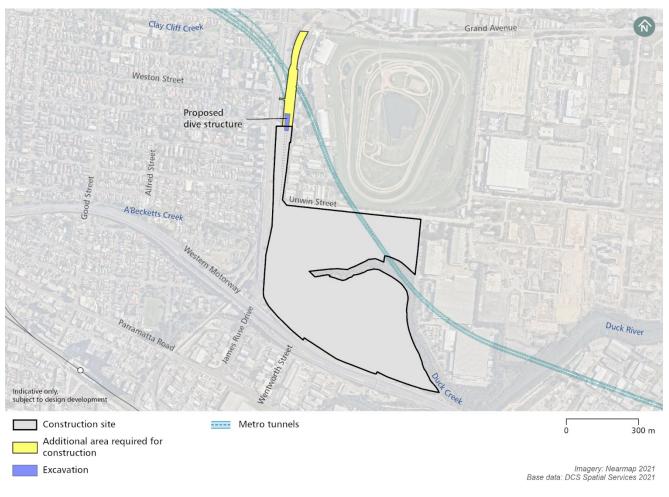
Clyde stabling and maintenance facility indicative construction site (proposed modification)
